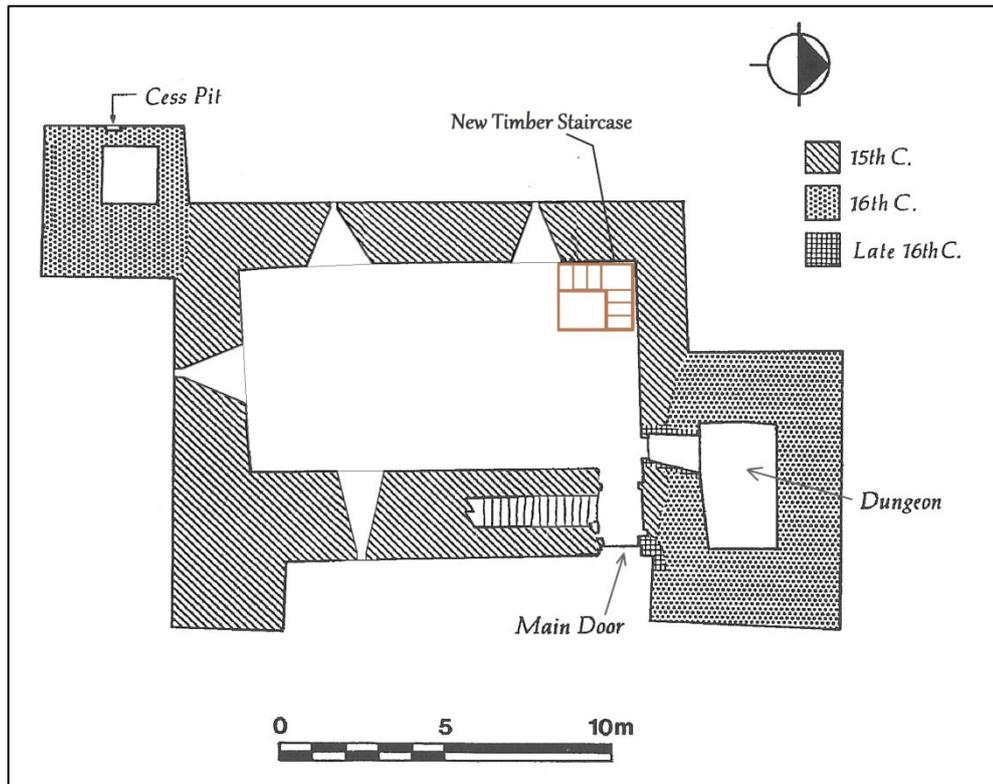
Plan view of ground floor in Barryscourt Tower House - Adjusted sketch from (Monk & Tobin, 1991)
